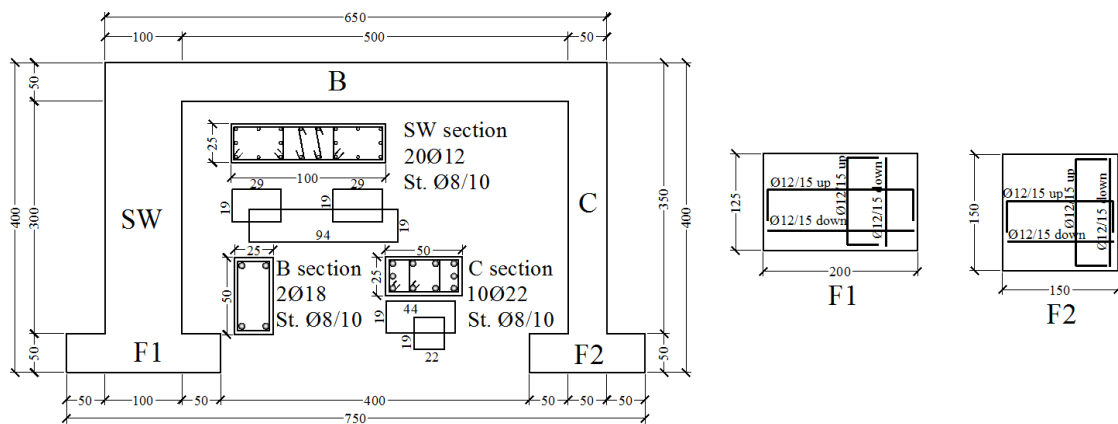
RC FRAME. GEOMETRY AND REINFORCEMENT DETAILS.
